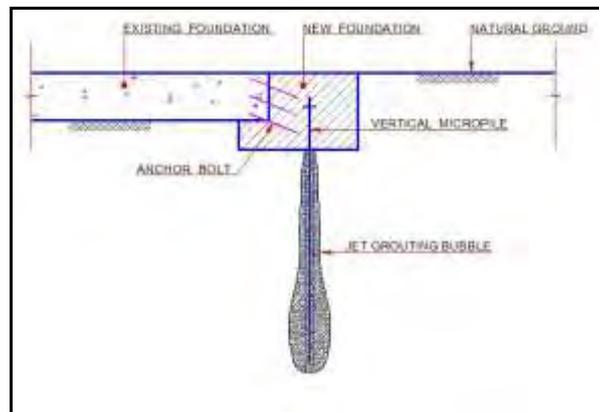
Cross section from the new and existing foundations and arrangement of vertical micropiles around it.
